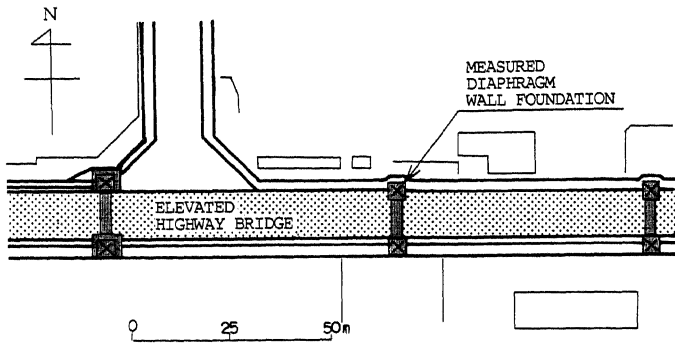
Location Of Measured Diaphragm Wall Foundation
